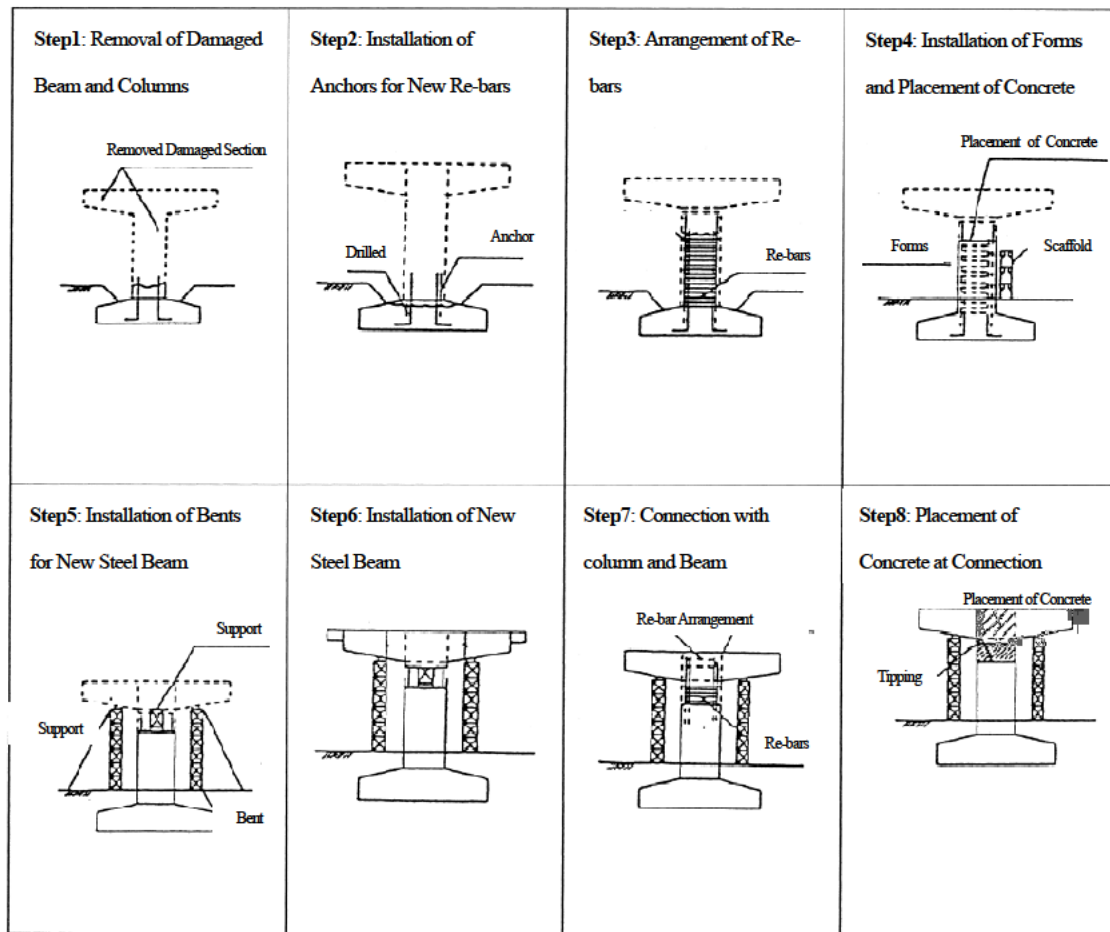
Reconstruction Method of Reinforced Concrete Piers
